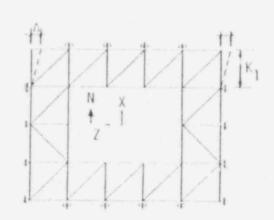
WALL MACRO - ELEMENT MODELING
